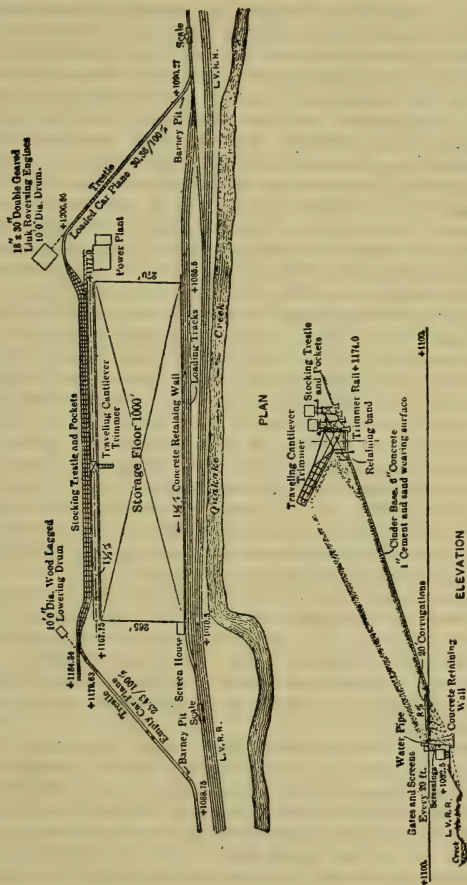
Hillside storage plant, Lehigh Valley Coal Co., Hudsonsdale, Pa. Plan and cross section.
